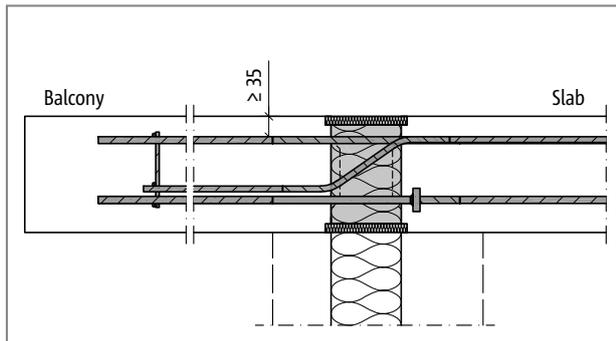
Schöck Isokorb® XT type C-CV35: Connection with non-load-bearing cavity wall masonry
